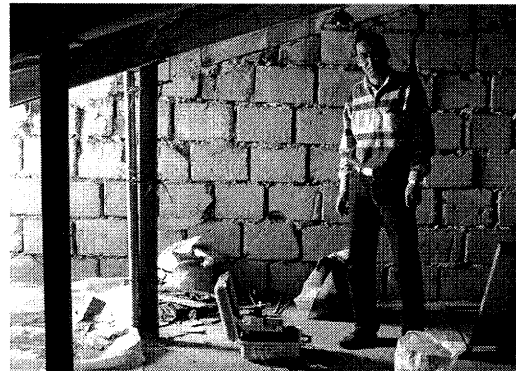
Roof floor of the structure in Photo.7 to see infilled wall. (with Mr. Sos Margaryan)
